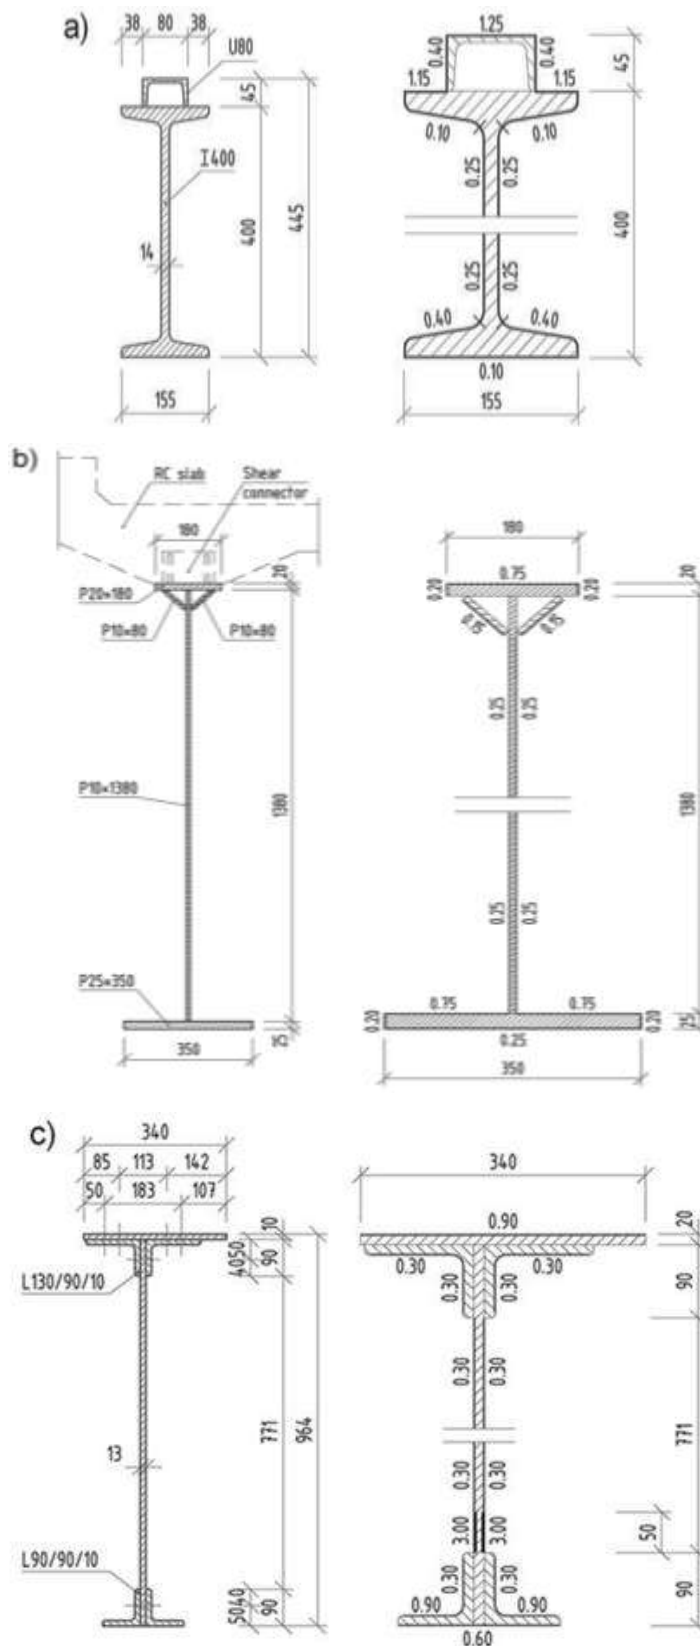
Cross-sections and measured corrosion losses of: a) the main girder of the road bridge A; b) the main composite girder of the bridge B on service road; c) the stringer in open deck of the railway bridge C; dimensions in millimeters.
